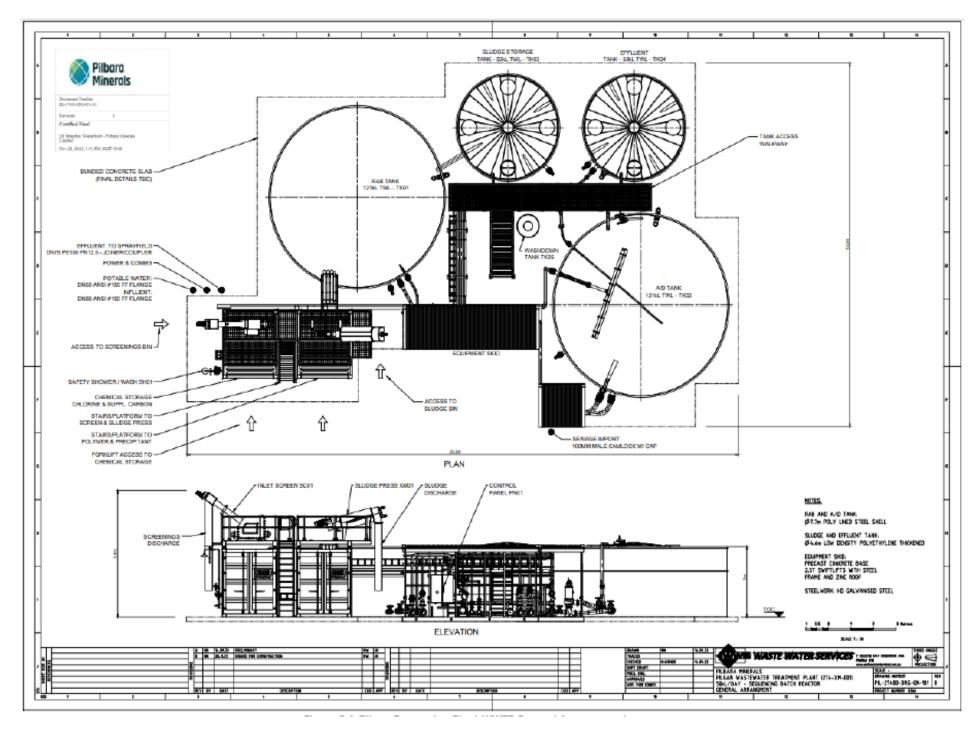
Pilgan Processing Plant WWTP General Arrangement
